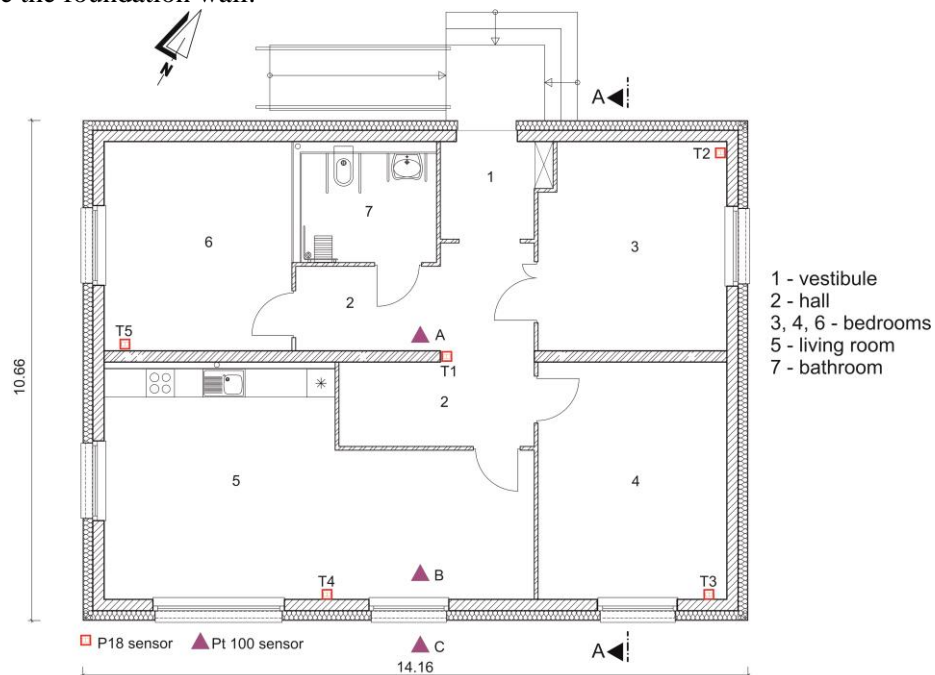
Ground floor plan of the experimental buildings, showing room layout and positions of indoor air temperature sensors (T1–T5) and ground temperature sensors (A–C)
